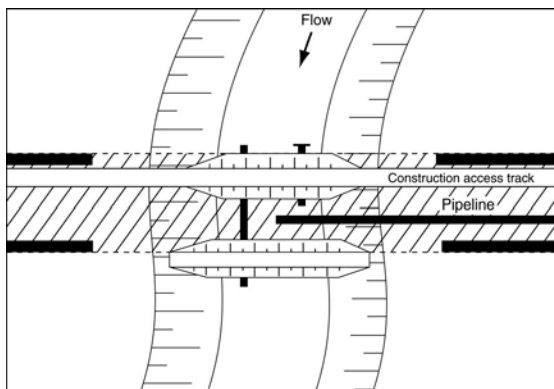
Stage 1 of pipeline installation with one of the bypass pipes taken off-line to allow better access for pipe installation
